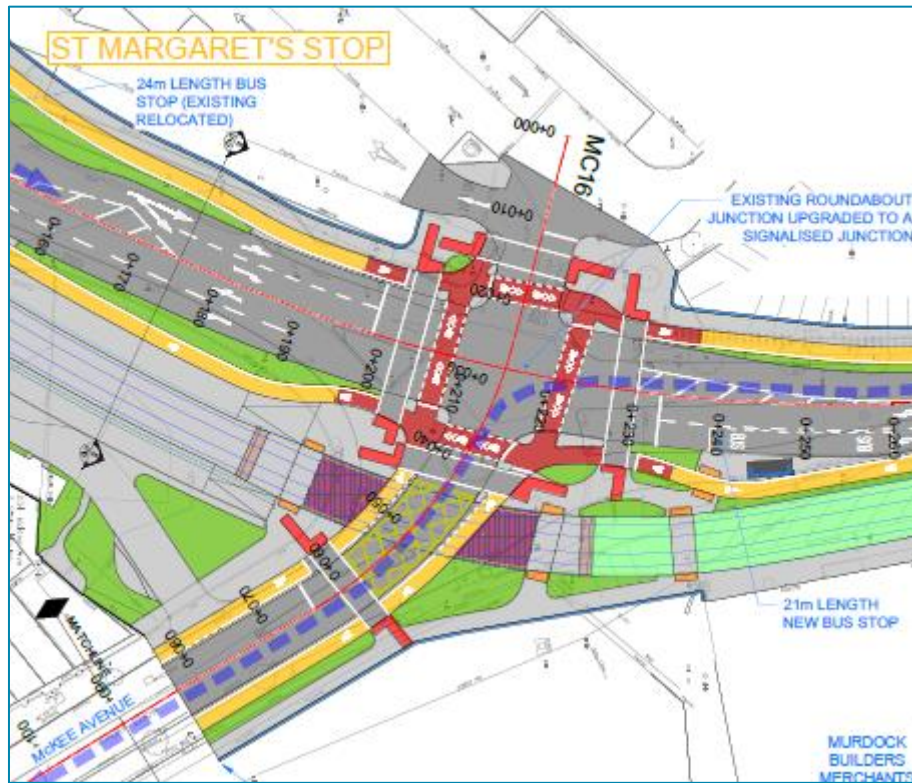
Proposed St Margarets Road / McKee Avenue Junction Design
